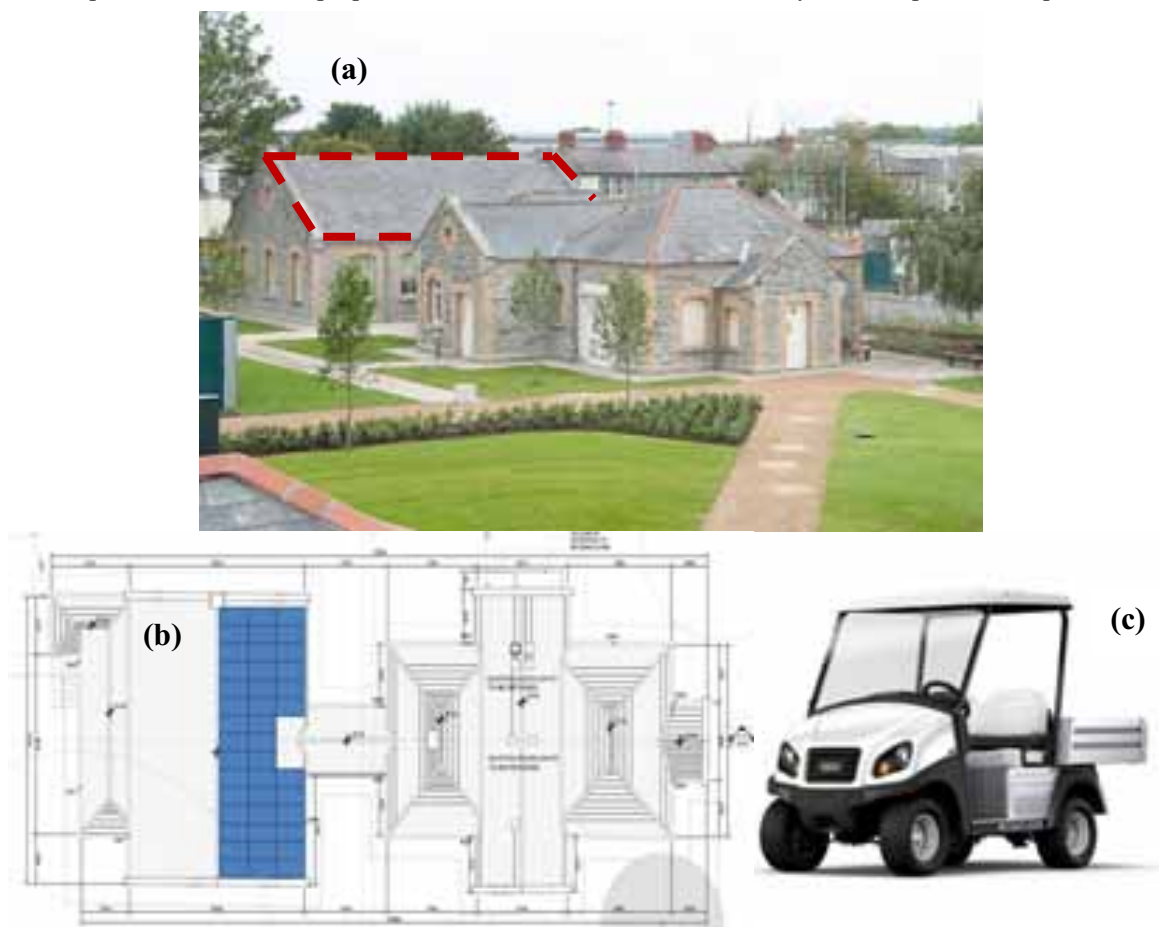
Orchard-House Building site (a), Roof schematic plans (b), CarryAll 500 LEV (c)
